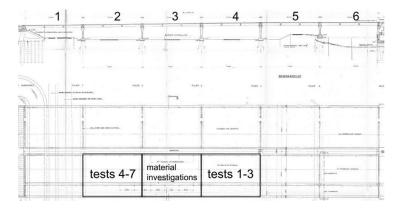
Partial overview of Vecht Bridge, longitudinal section (top) and top view (bottom).
